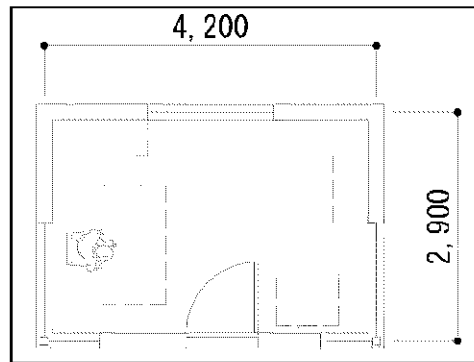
(16) Layout for Fish Control and Operator Room for Ice
